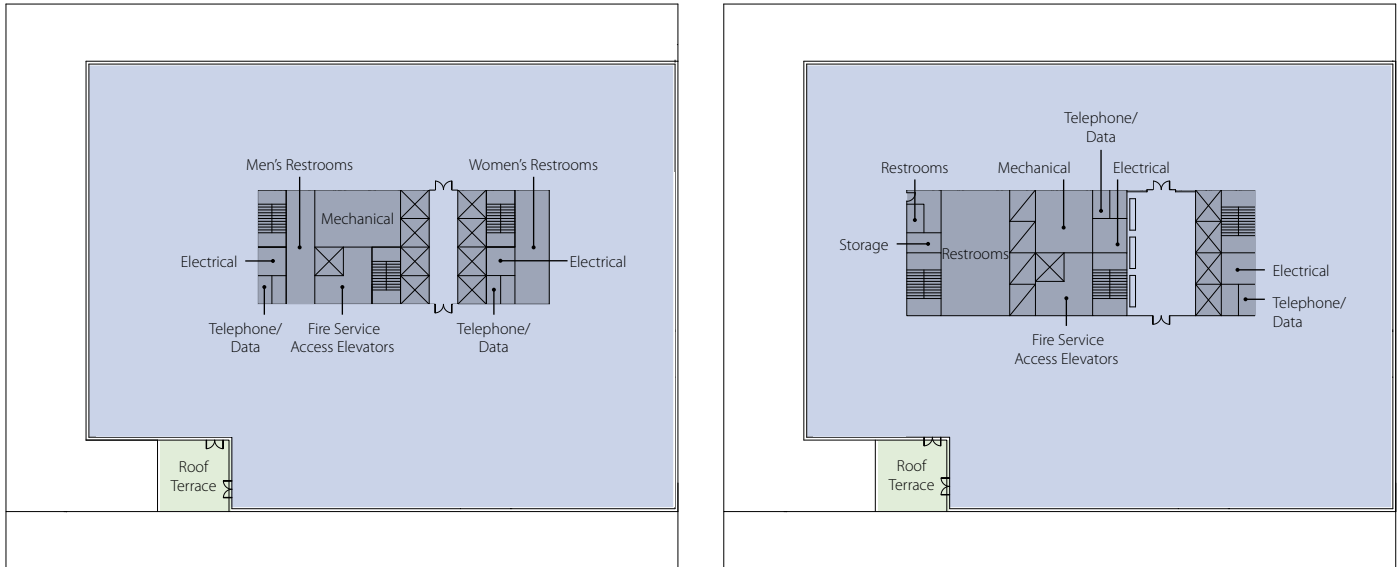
Left: Typical office floor plan of the base design from a case study of a Manhattan office building. Right: Typical office floor plan of the pandemic-resilient design from a case study of a Manhattan office building, allowing for a wider range of uses and configurations in the core, and more social distancing. © FXCollaborative
